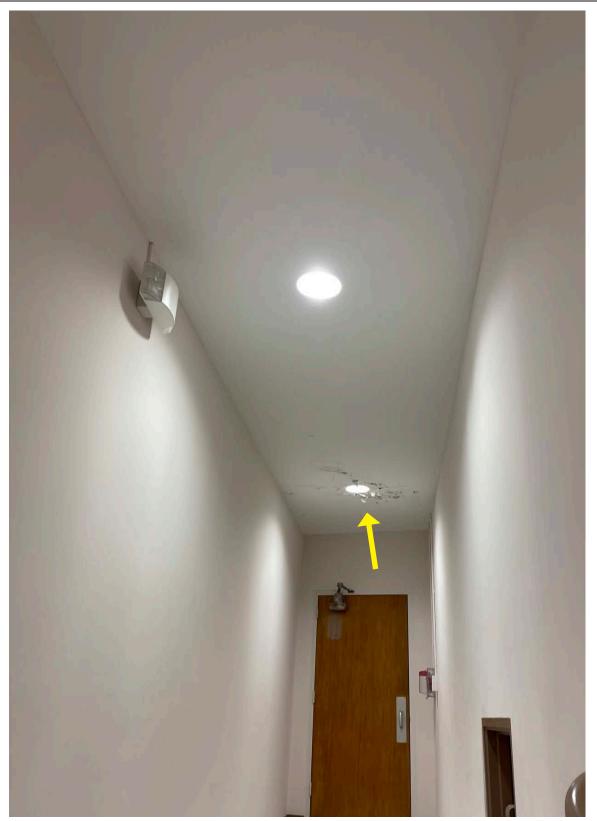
Weldon Auditorium: South stair to balcony. ceiling damage present at the balcony level.
